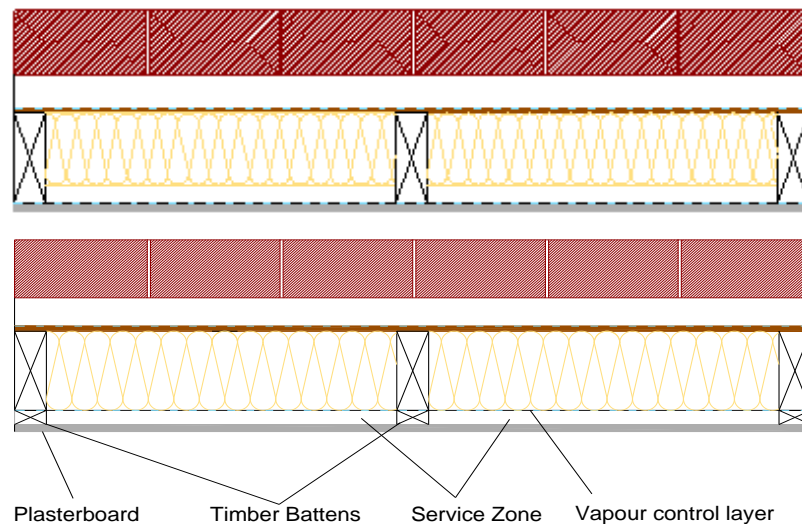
(a) Timber frame studs wall with the insulation layer not fully filling the gap (b) Timber frame studs wall with a service zone
